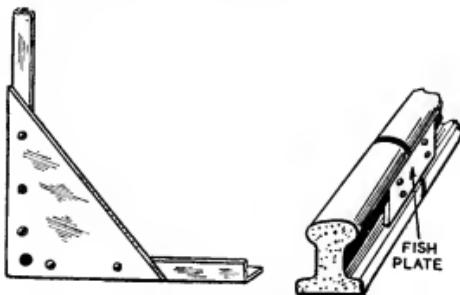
A "gusset" for strengthening joints, and a "fish" plate for joining rails or girders
